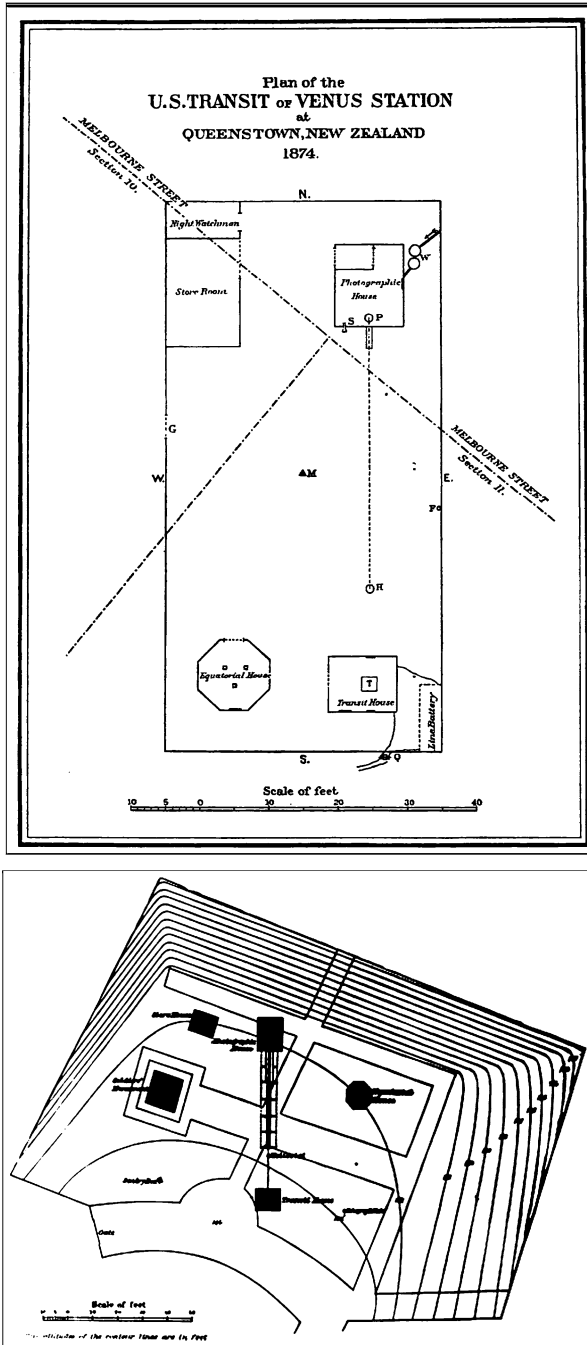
Plans of the Queenstown (top) and Hobart (bottom) transit stations showing in each case the locations of the photographic telescope, “transit house” and “equatorial house”.
